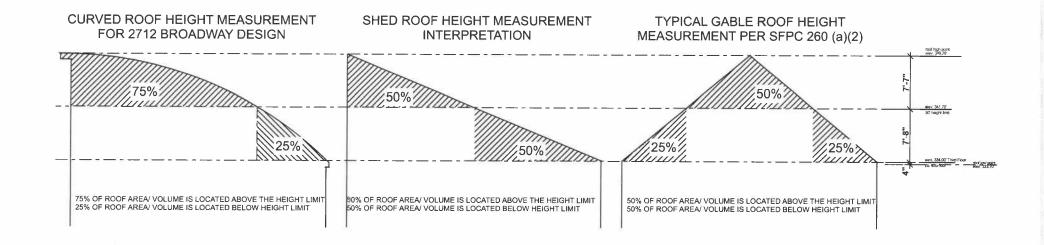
EXHIBIT A ROOF DIAGRAMS SFPC Section 260(a)(3) Project Team
